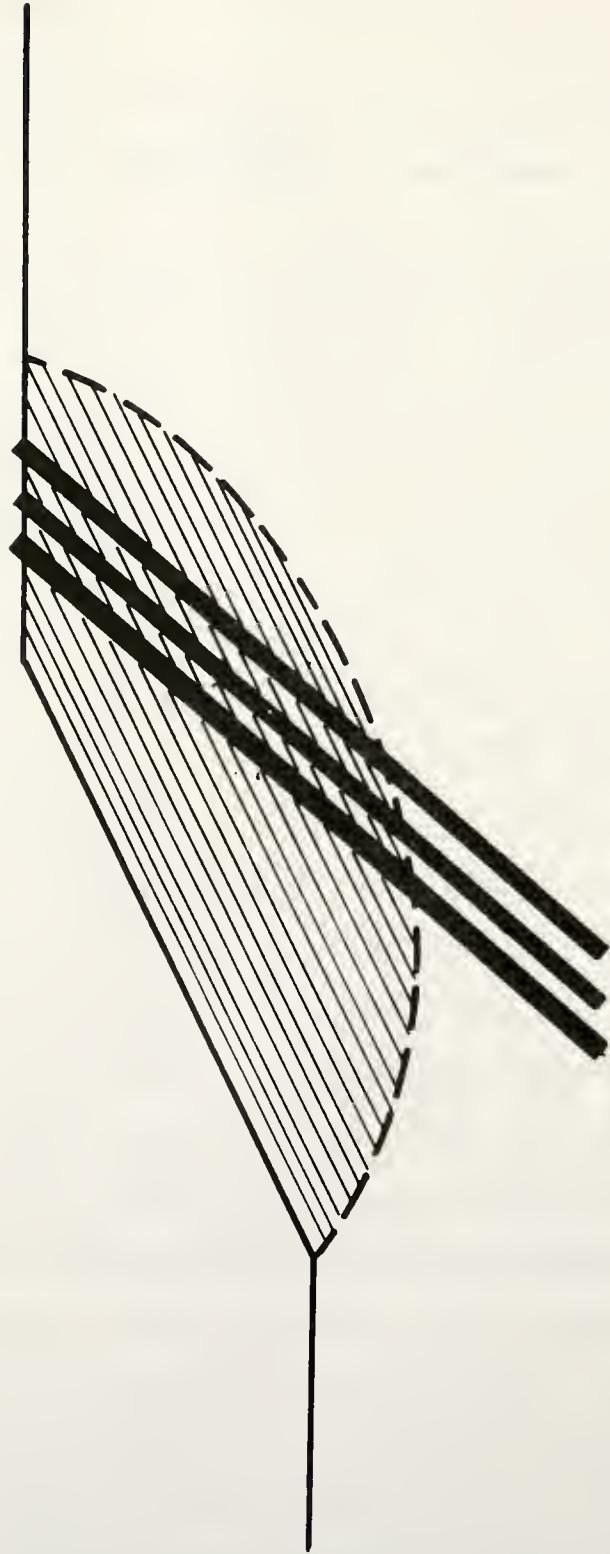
Battered Timber Piles Used to Stabilize Slopes
